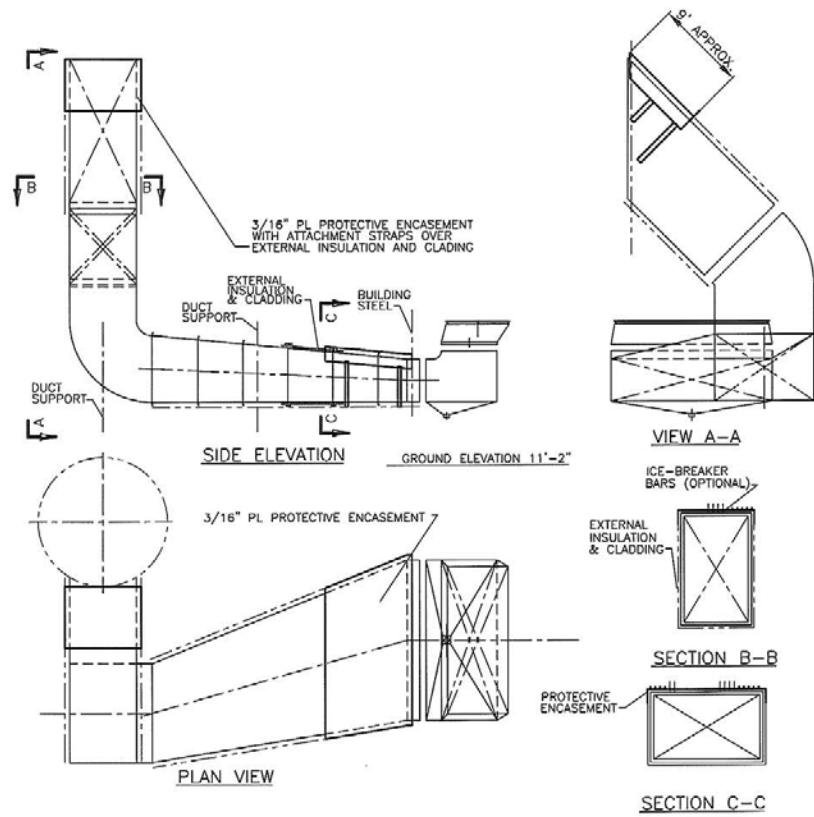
Proposed cladding protection – 7ga. plate encasement
